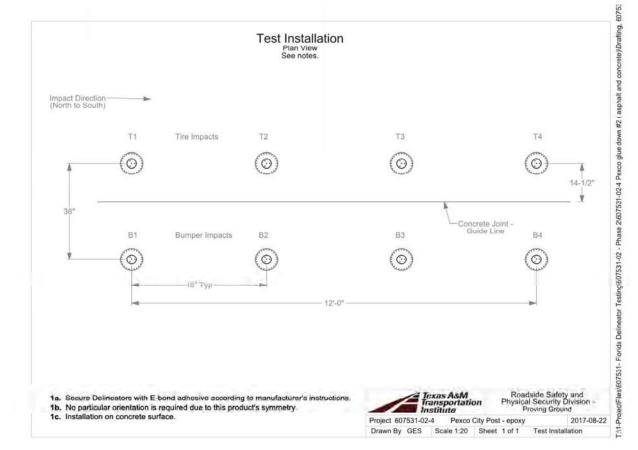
607531-02-4 Test Setup Details on Concrete Surface.
